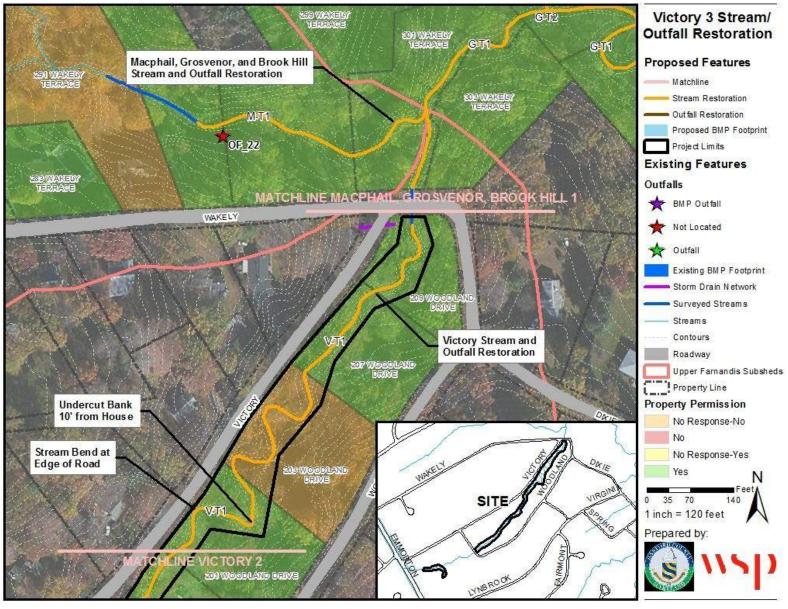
Site Location and Proposed Plan for Victory Stream and Outfall Restoration (Sheet 3 of 3)
